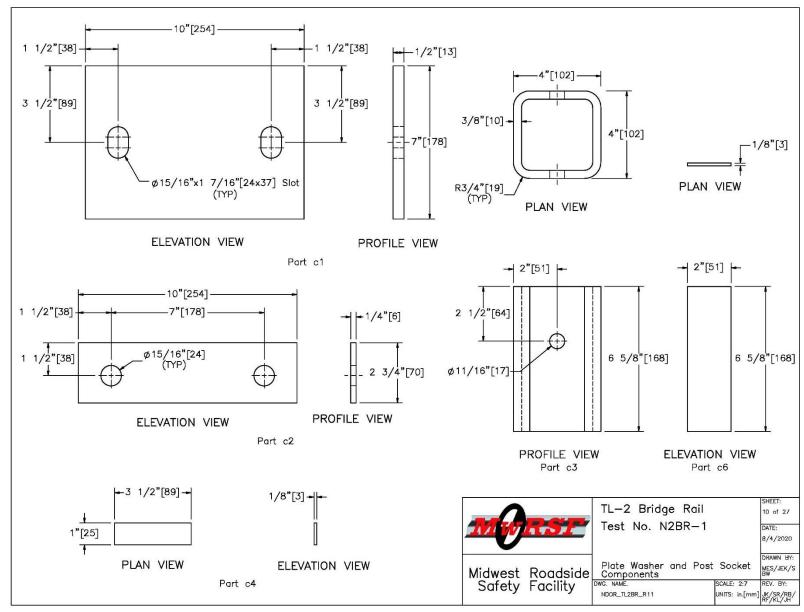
Plate Washer and Post Socket Components, Test No. N2BR-1
